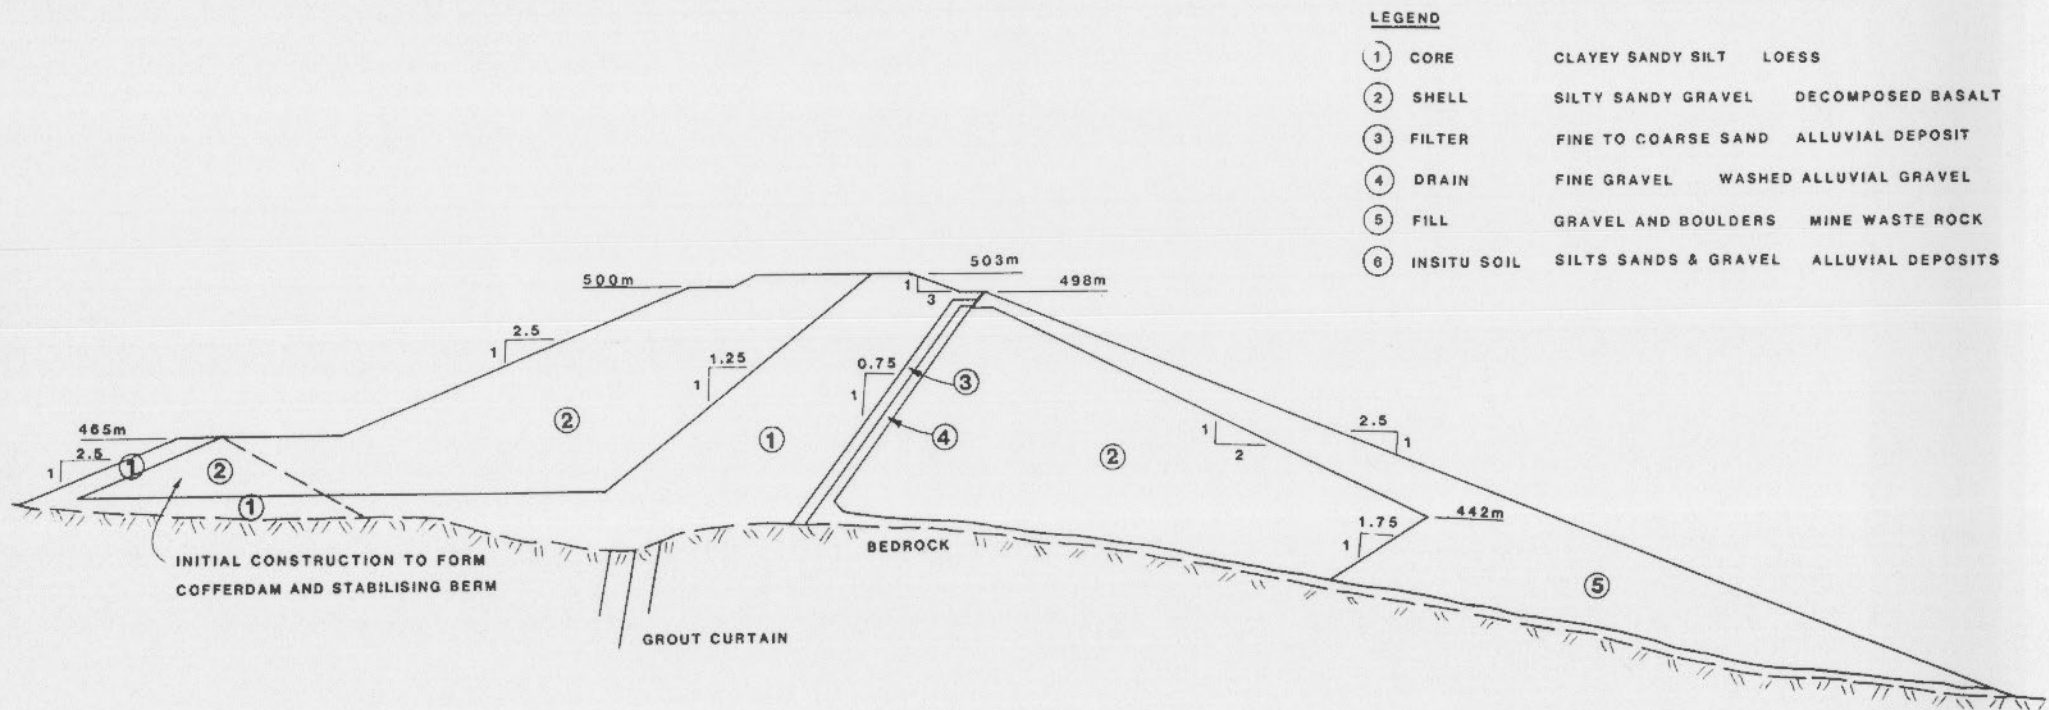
INITIAL CROSS SECTION OF EMBANKMENT AT BIDDING STAGE
